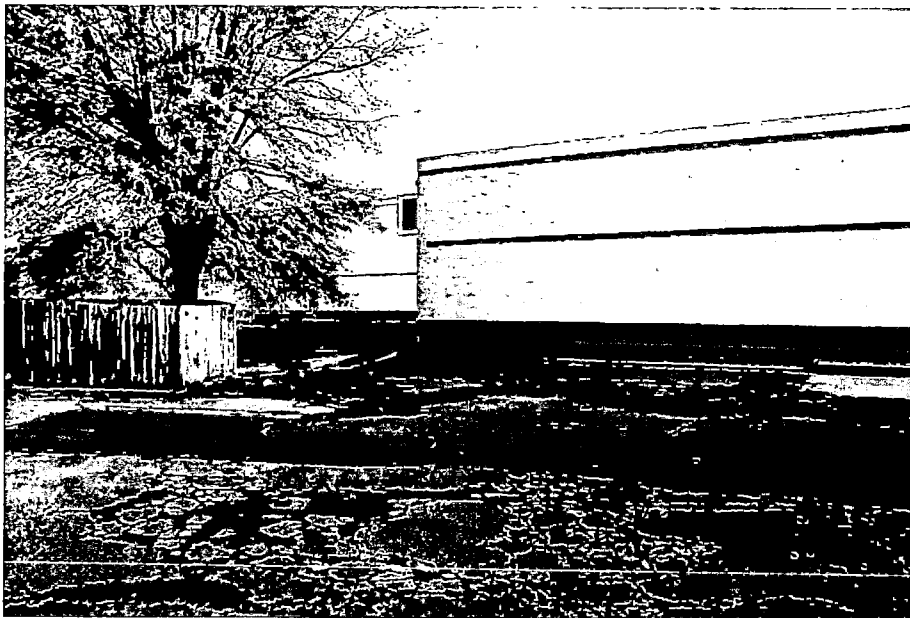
Southwest facing elevation (Staples and unoccupied space).
